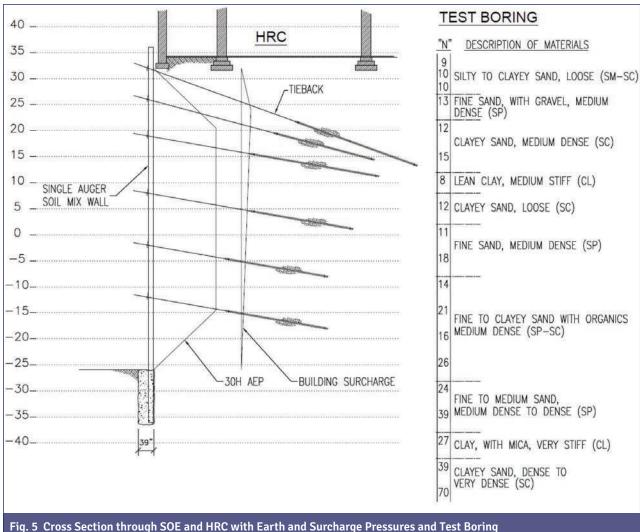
also shows that a 30H apparent earth pressure (AEP) diagram was used to design the SOE in front of the two buildings. Building surcharges were added to the AEP diagram. The design did not include any hydrostatic pressures. Once the tieback loads and pile sizes were calculated, deflection-based design was performed so that any building damage would be limited to "negligible" or "very slight" as defined in Fig. 3. Due to the deflection-based design considerations, the pile size was increased and an additional tier of tiebacks was added to the upper 17 feet of the SOE wall.
